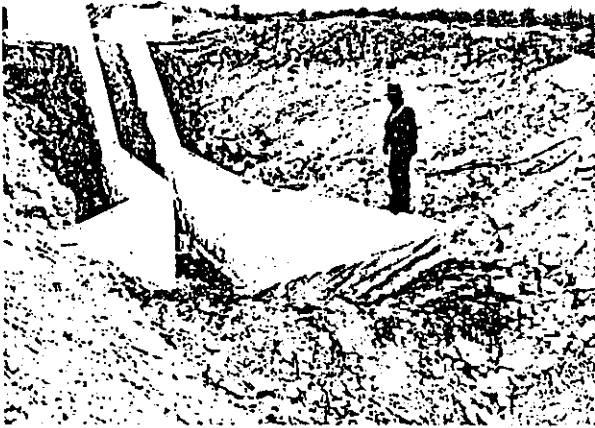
Rectangular inclined drop under construction. P 222-117-36402
